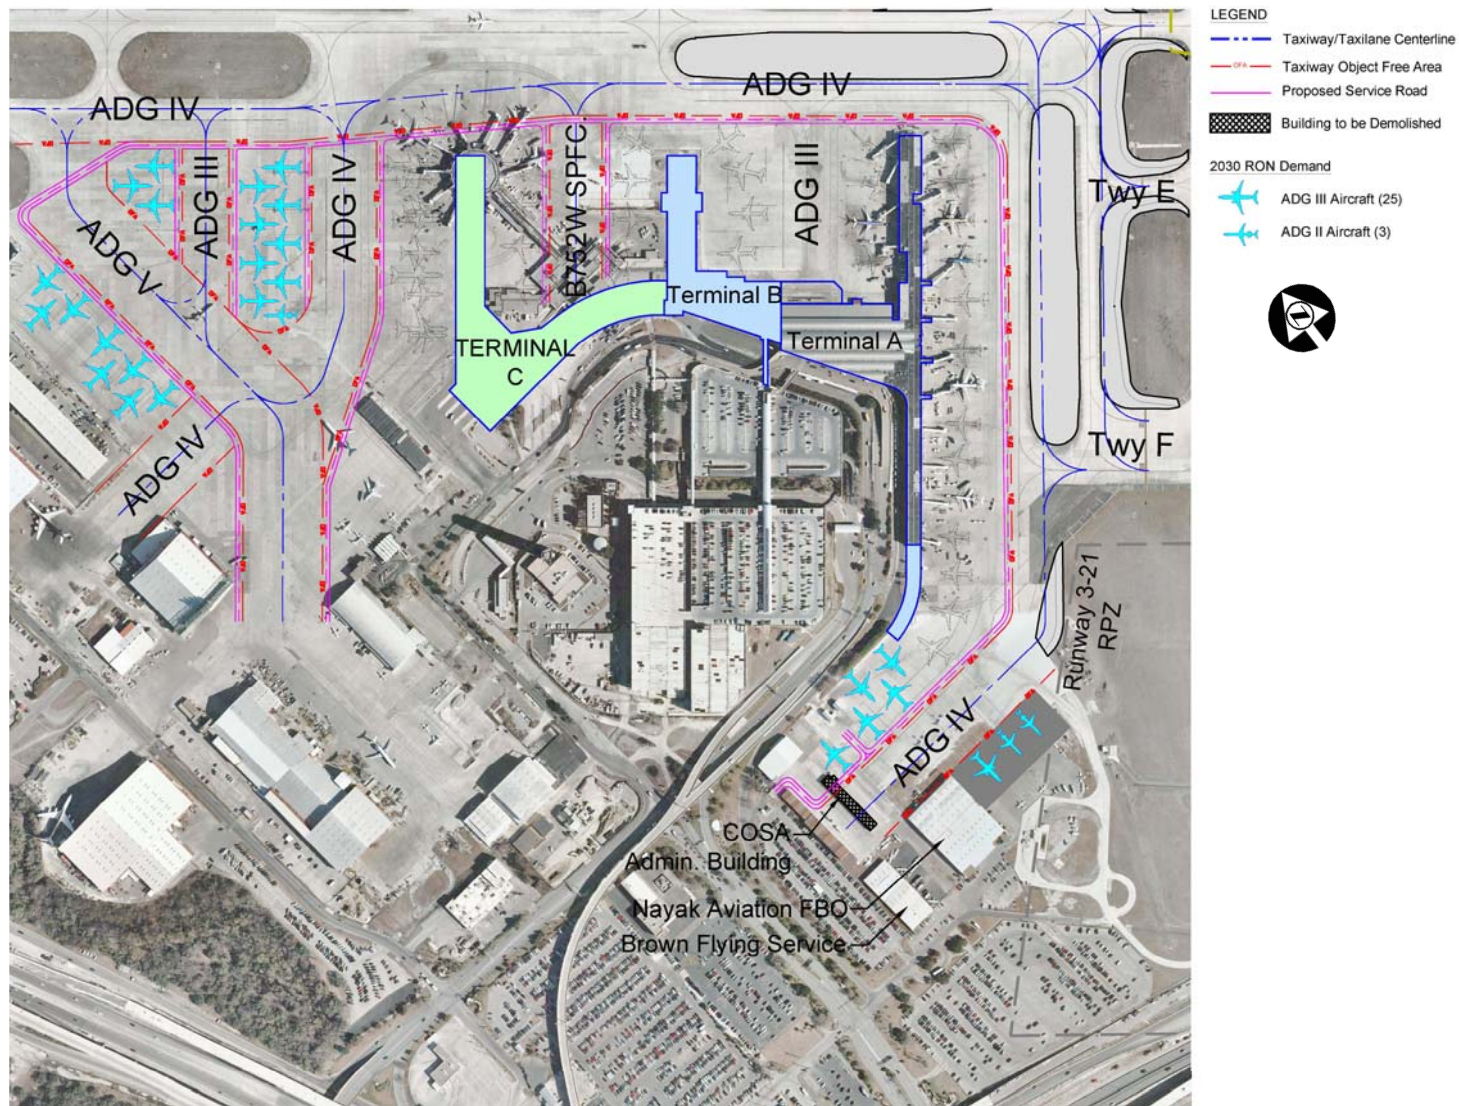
Proposed RON Aircraft Layout – Alternative 2
